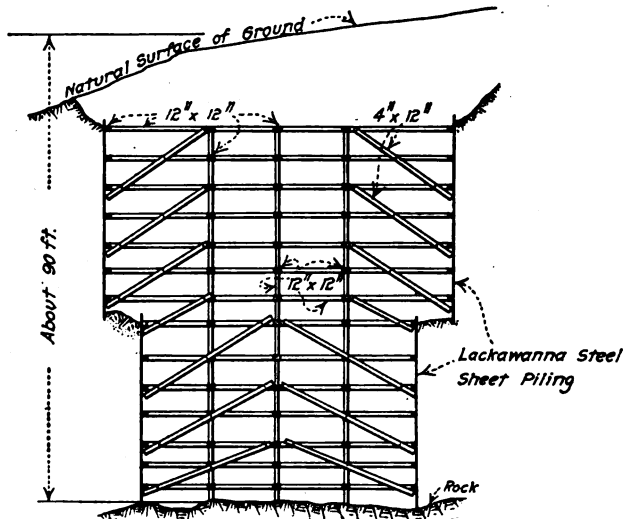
Tunkhannock viaduct. Details of cofferdam sheeting and bracing.
